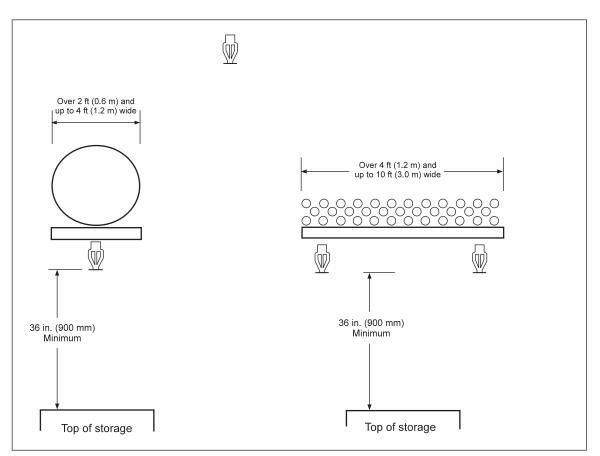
Additional sprinklers installed below non-flat, non-continuous, or non-solid obstructions more than 2 ft (0.6 m) wide up to 10 ft (3.0 m) wide
